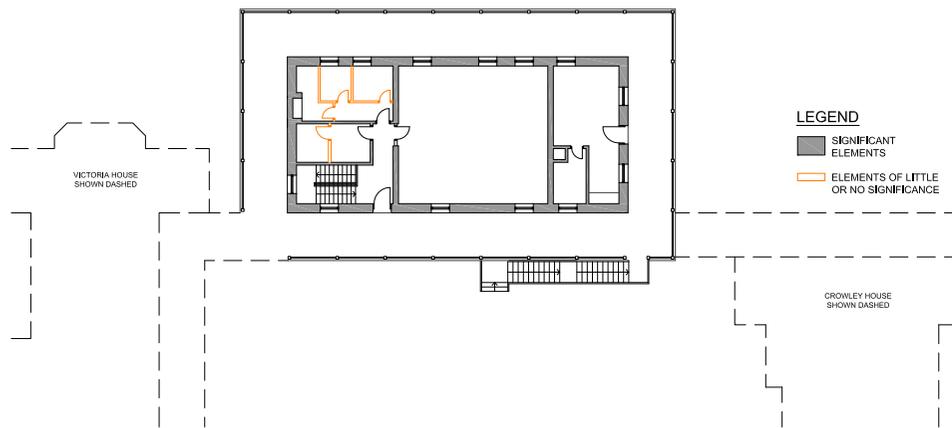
D - CAMPBELL HOUSE FIRST FLOOR
